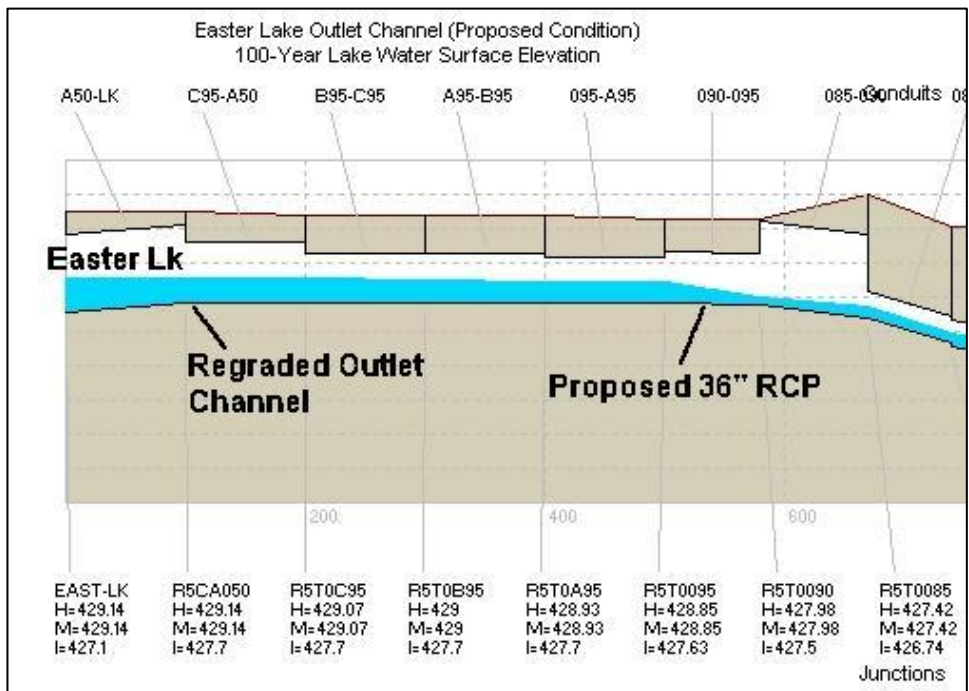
Easter Lake Proposed Outlet Channel, 100-year Water Surface Elevation (Computed using SWMM EXTRAN model)
